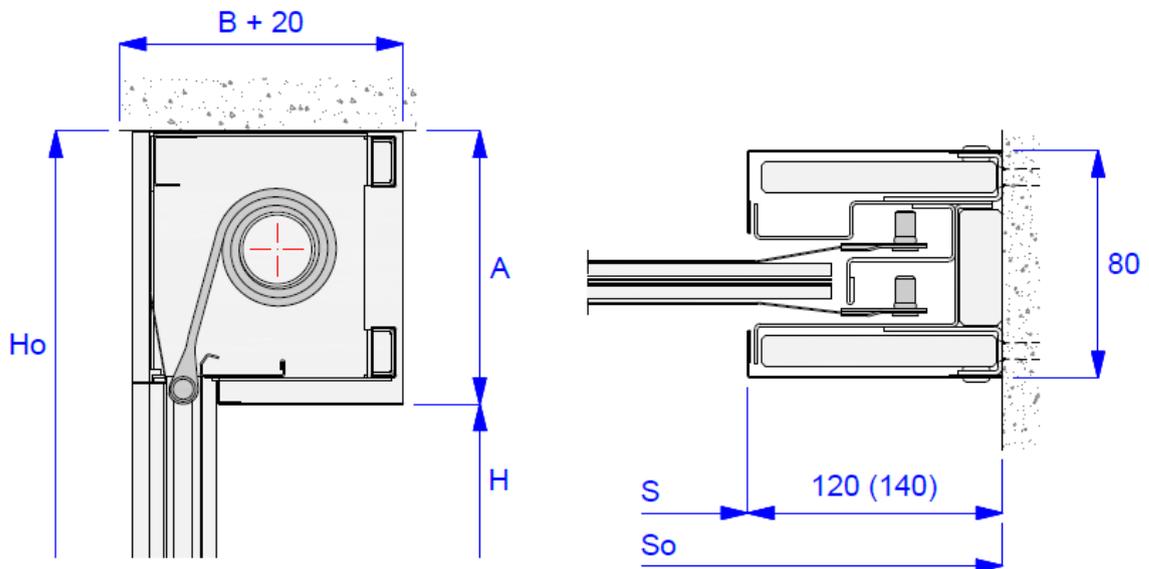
ISOiK-Ok60-01.04 MARC-Ok + EI60 fire protection curtain door – corridor installation (recessed)
